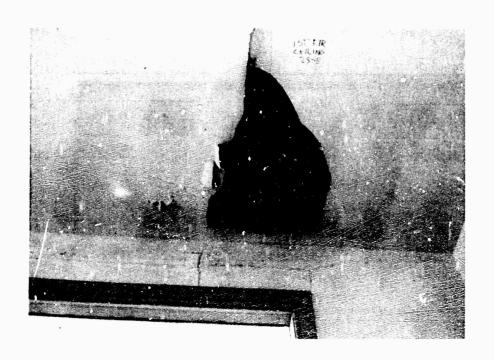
2S-5, Ceiling in 1st Floor. Note Extreme Contraction of Wood Lath Giving Low Bond Strength to Plaster Keys.
